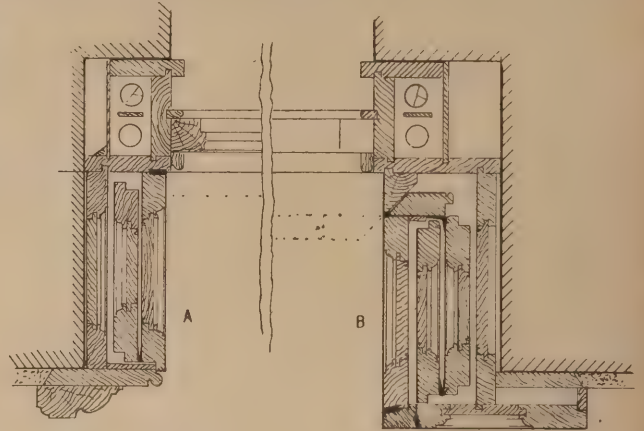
TWO HALF PLANS OF BOXING SHUTTERS.
